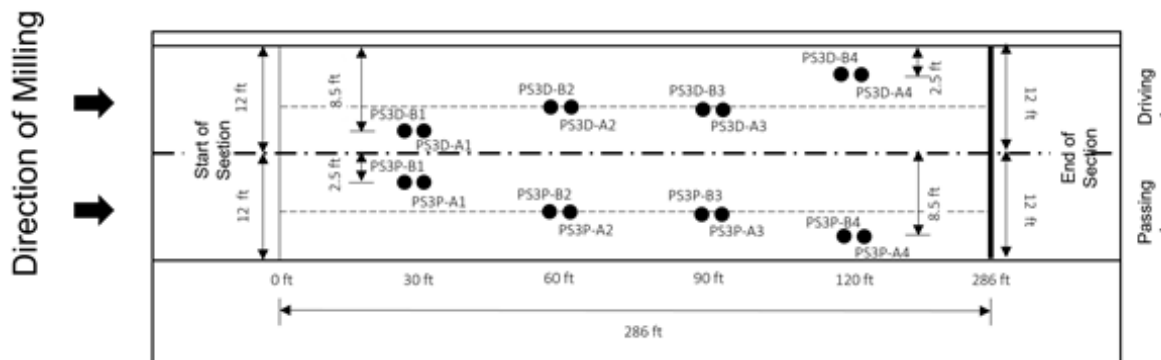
Cell 2 Sampling Plan (not to scale)
